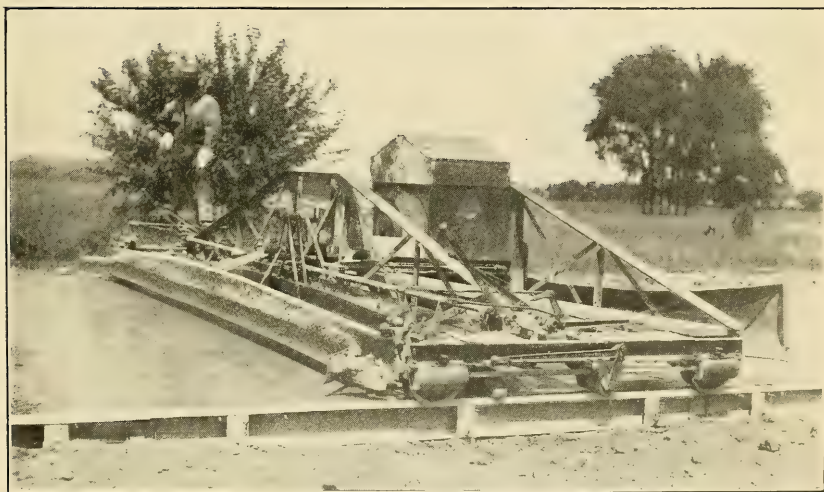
MECHANICAL FINISHING MACHINE FOR CONCRETE PAVEMENTS.
